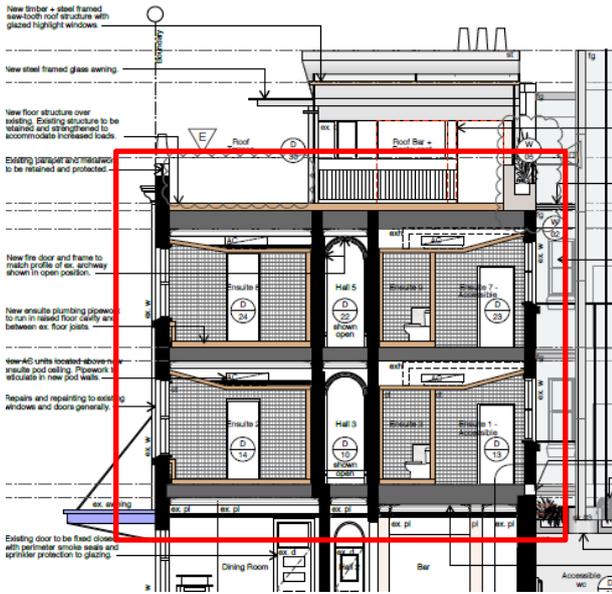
Section C, note the installation of AC units in void between pod and extant ceiling
